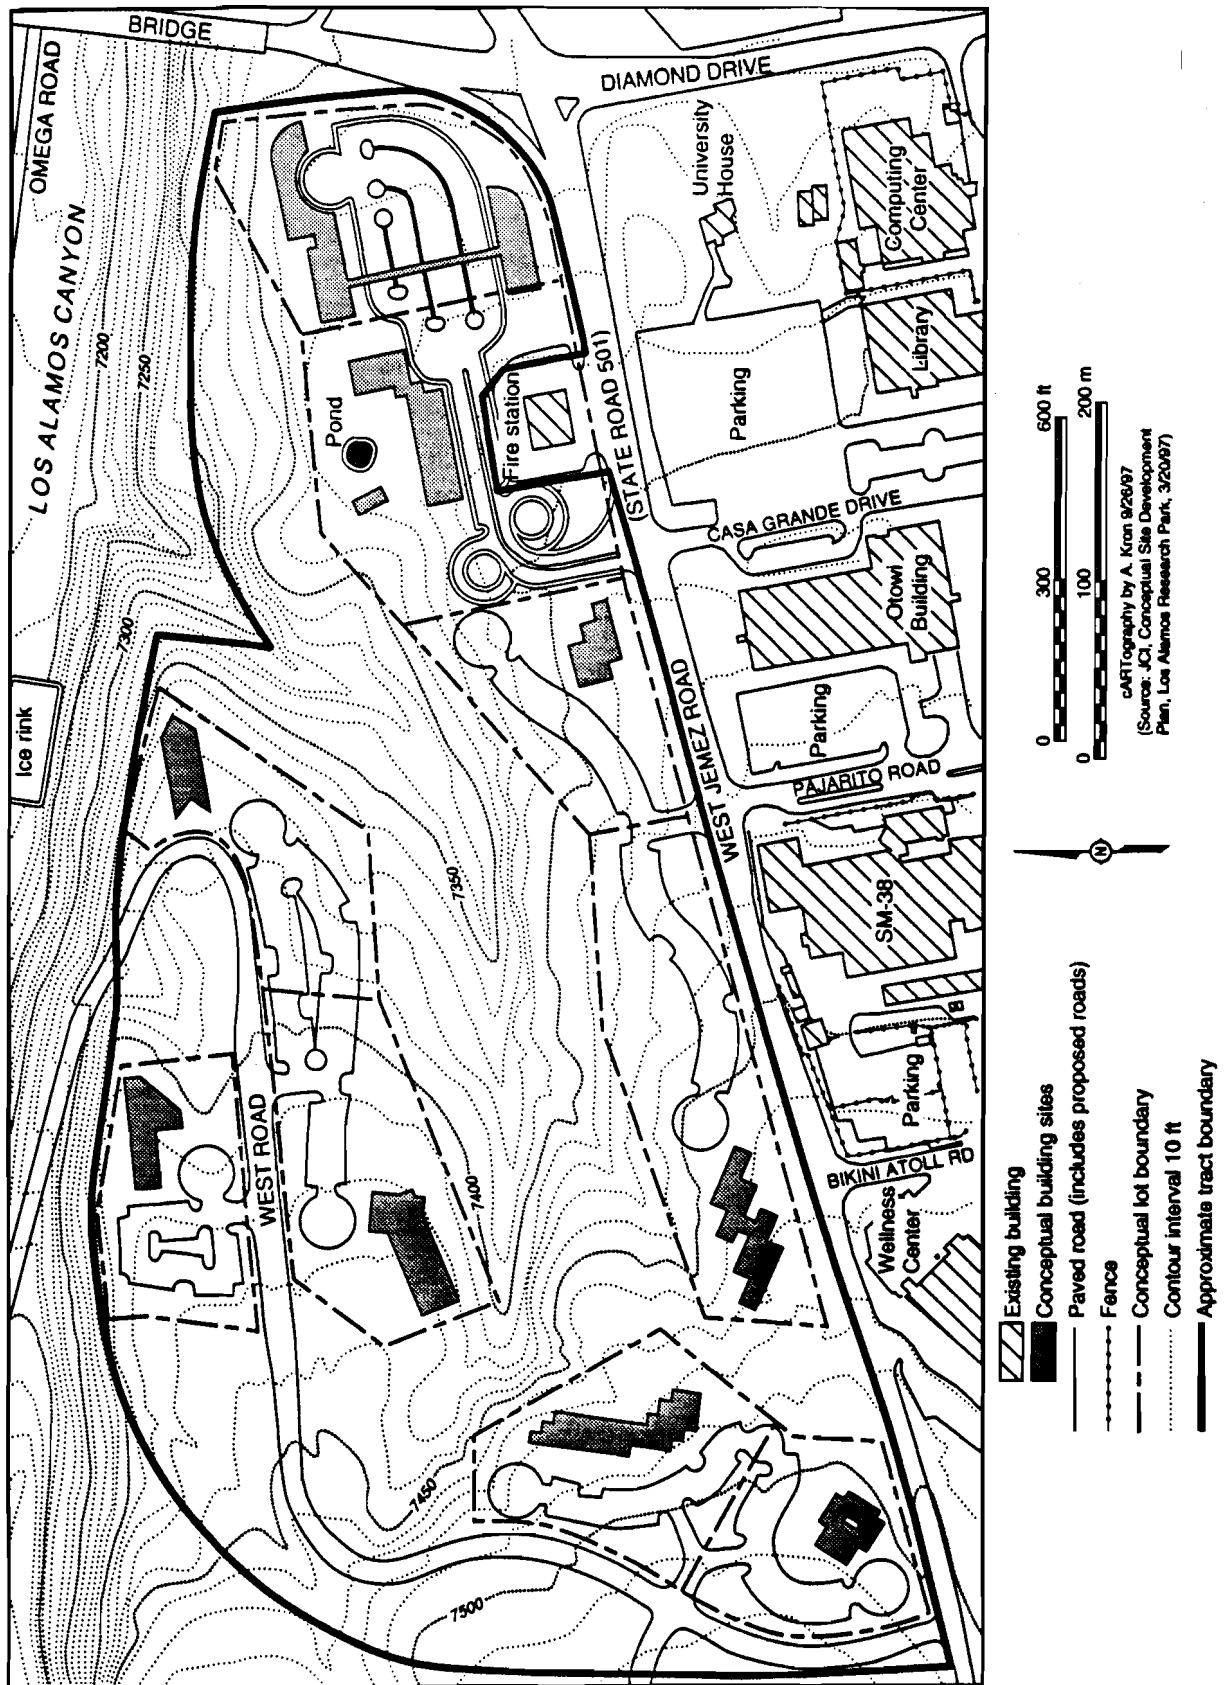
Conceptual site plan/Alternative No. 2 for proposed Research Park.
